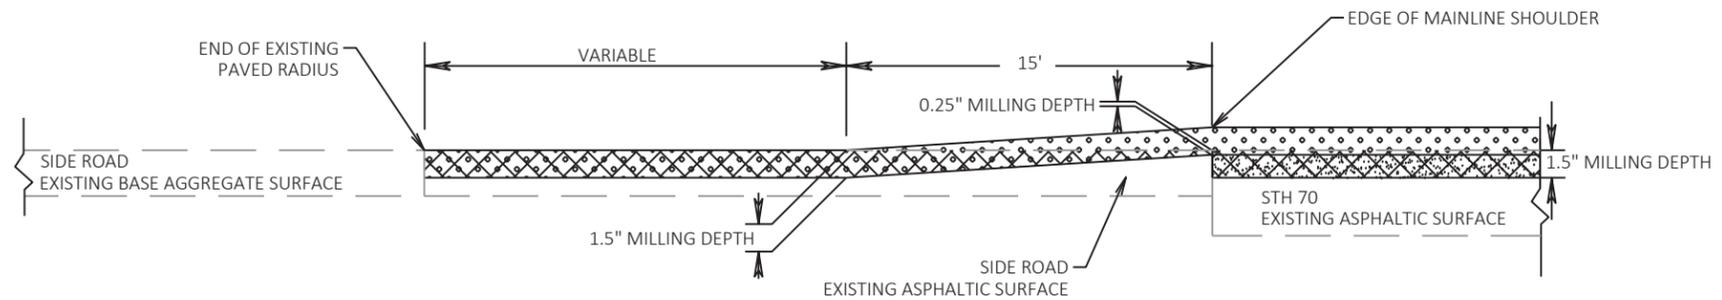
DETAIL FOR PAVED SIDE ROAD CONSTRUCTION JOINT
